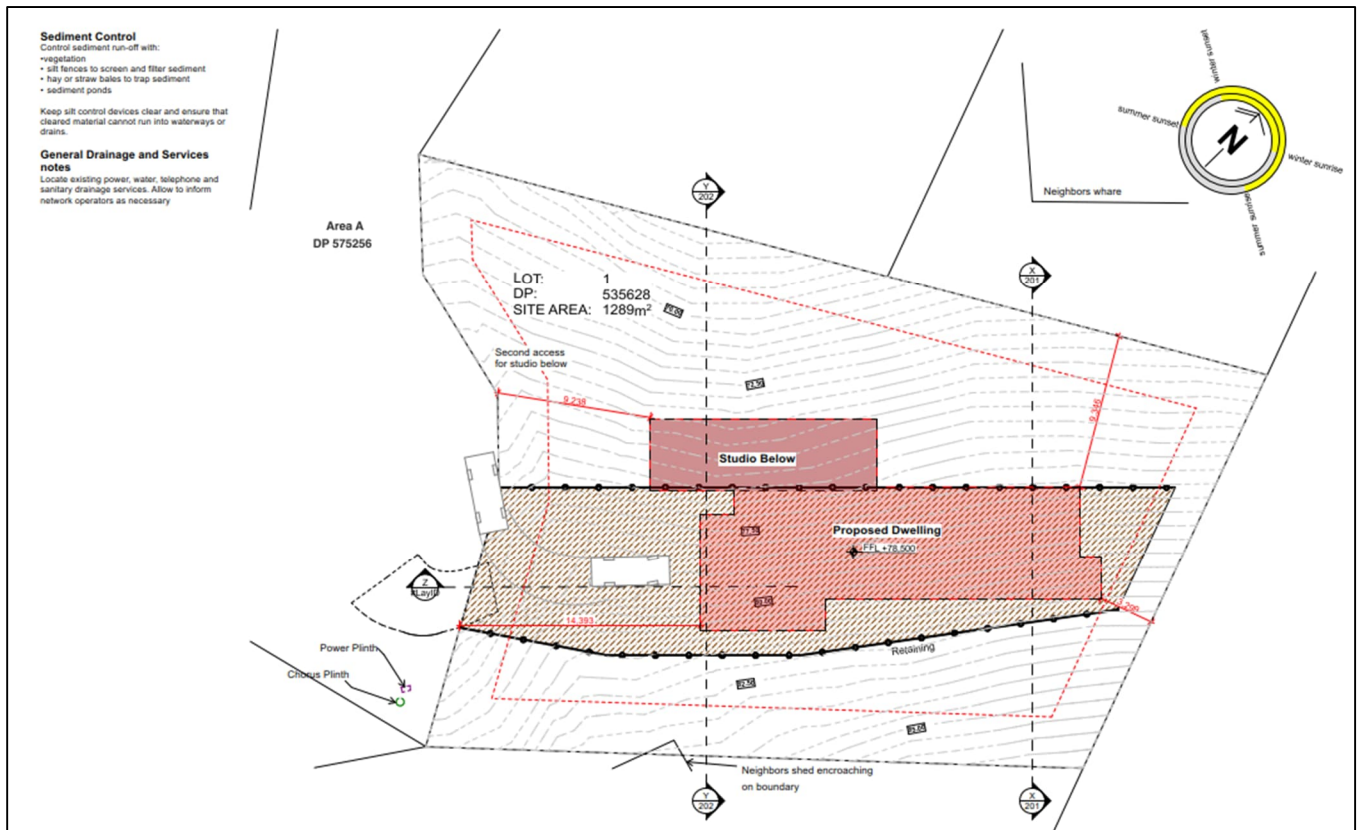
Excerpt from Mason Street Architectural Drafting plans, dated 18/07/2025
